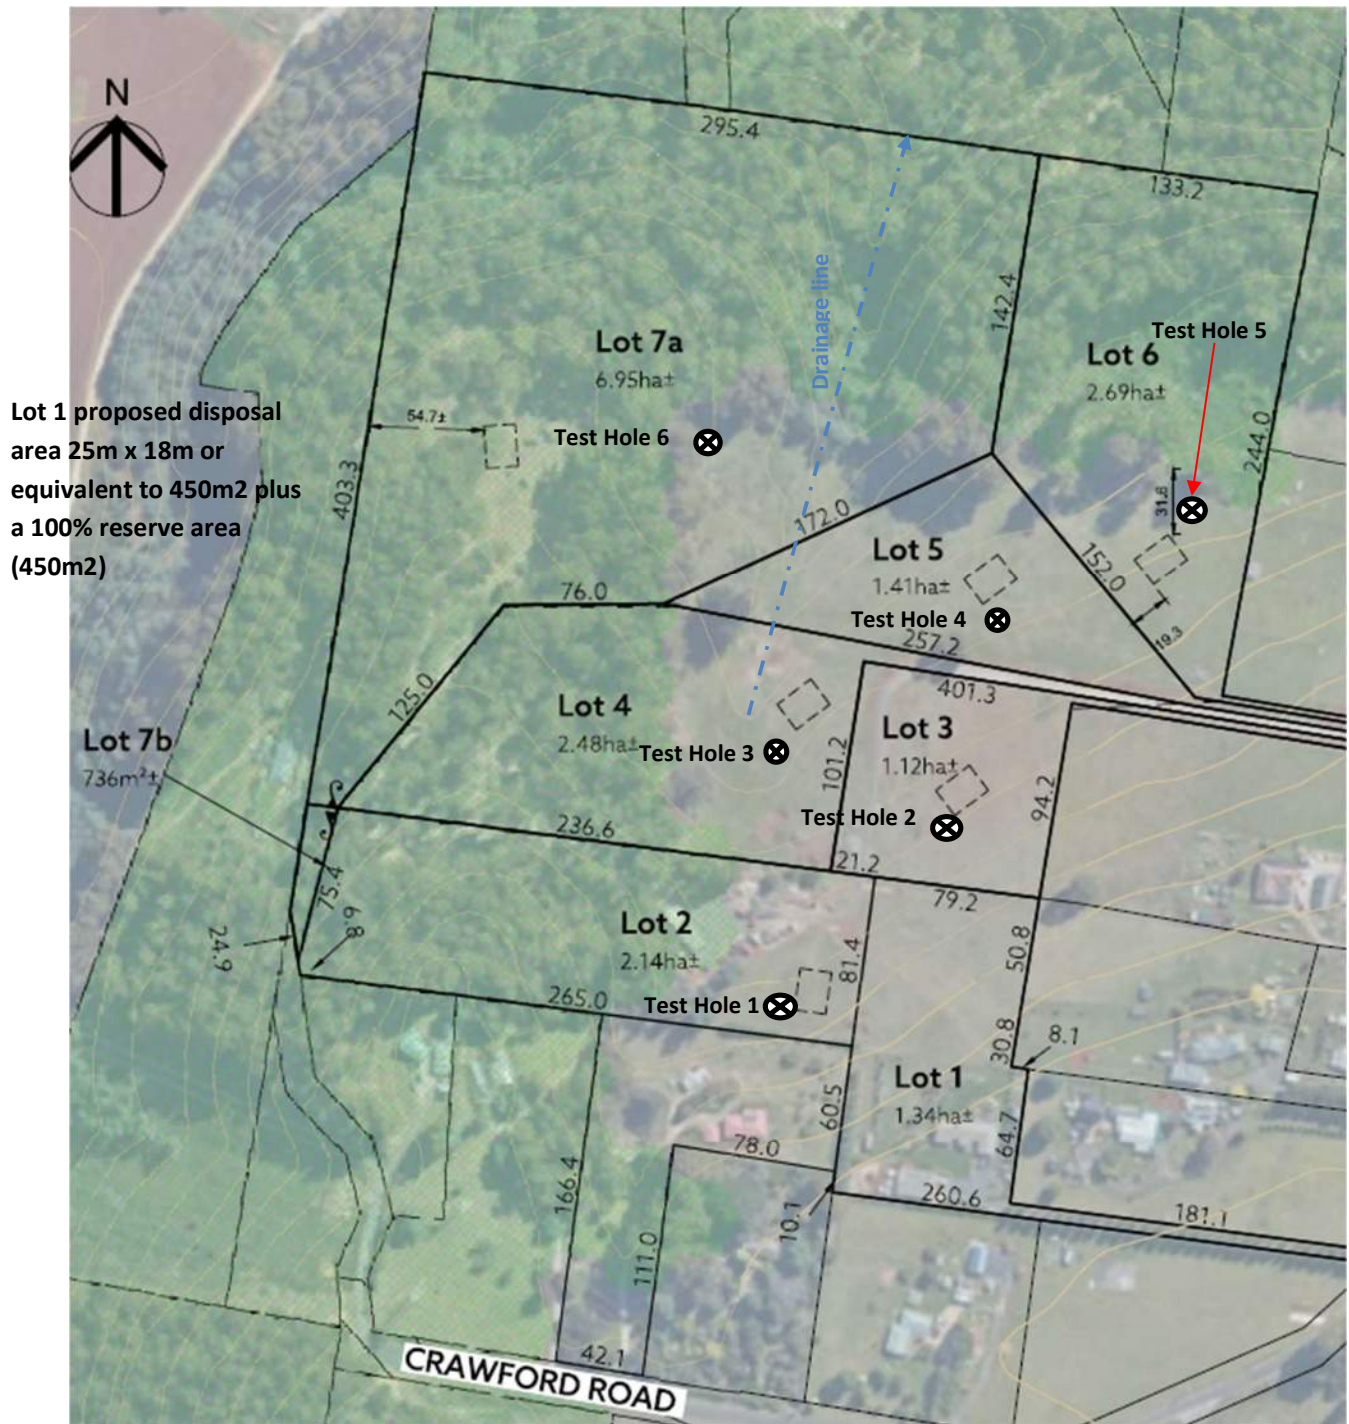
Site Plan showing Test Holes (ref PDA Surveyors)
